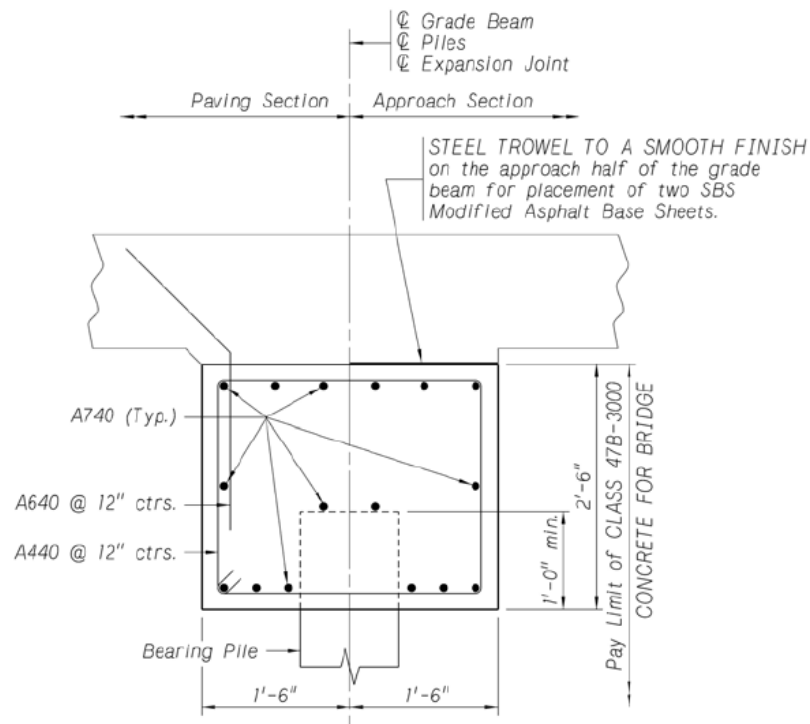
A typical section of the grade beam that supports the approach slab in Nebraska.
